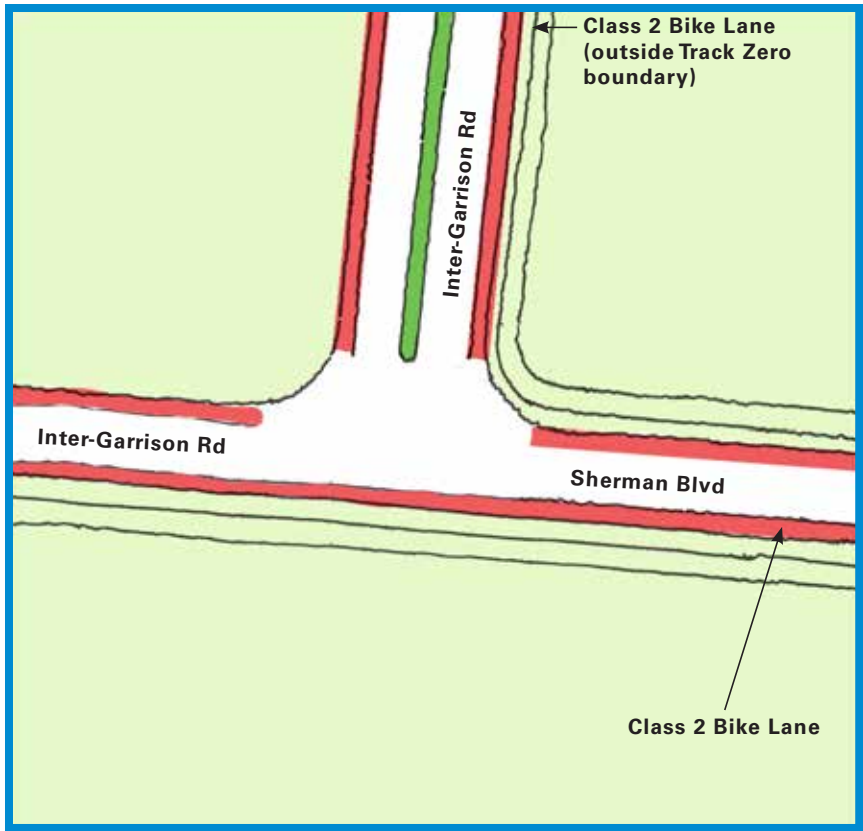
Traffic Circle-Bike Details Intersection Bike Lane Detail
